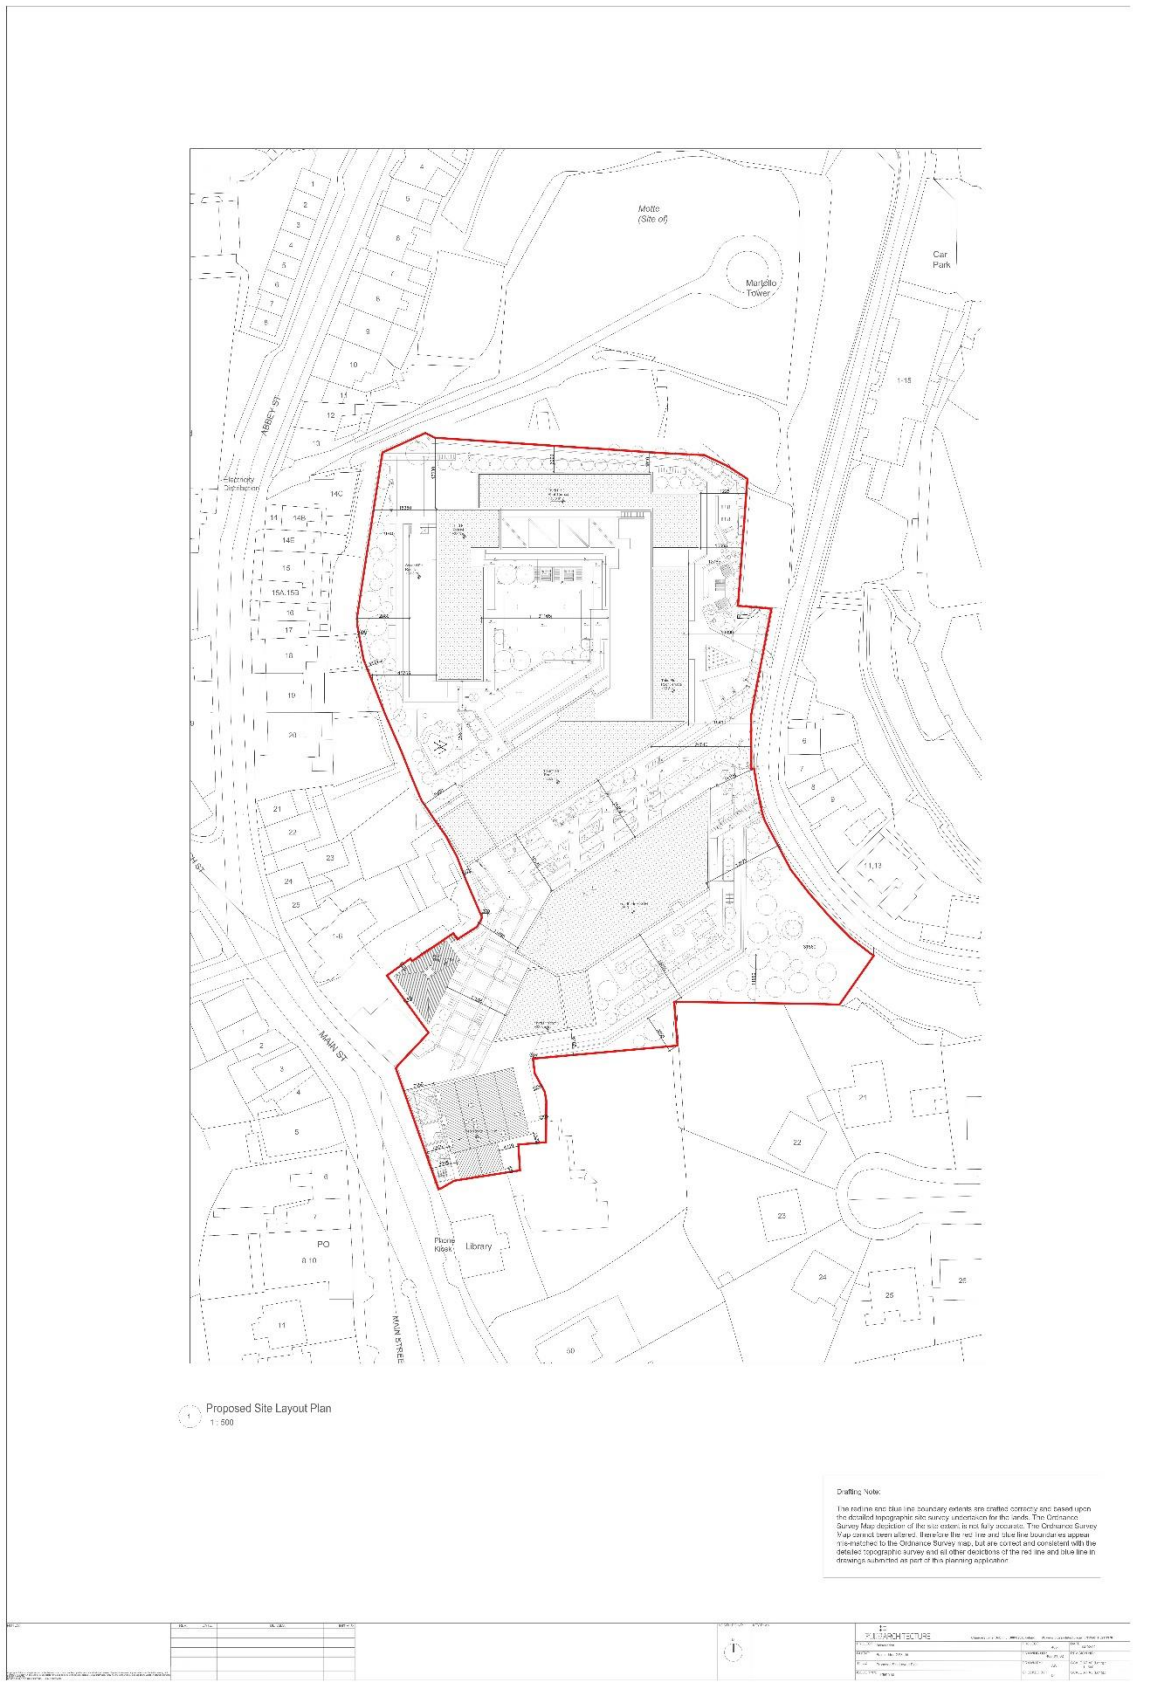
Proposed Development Site Layout (Plus Architecture, 2022)
